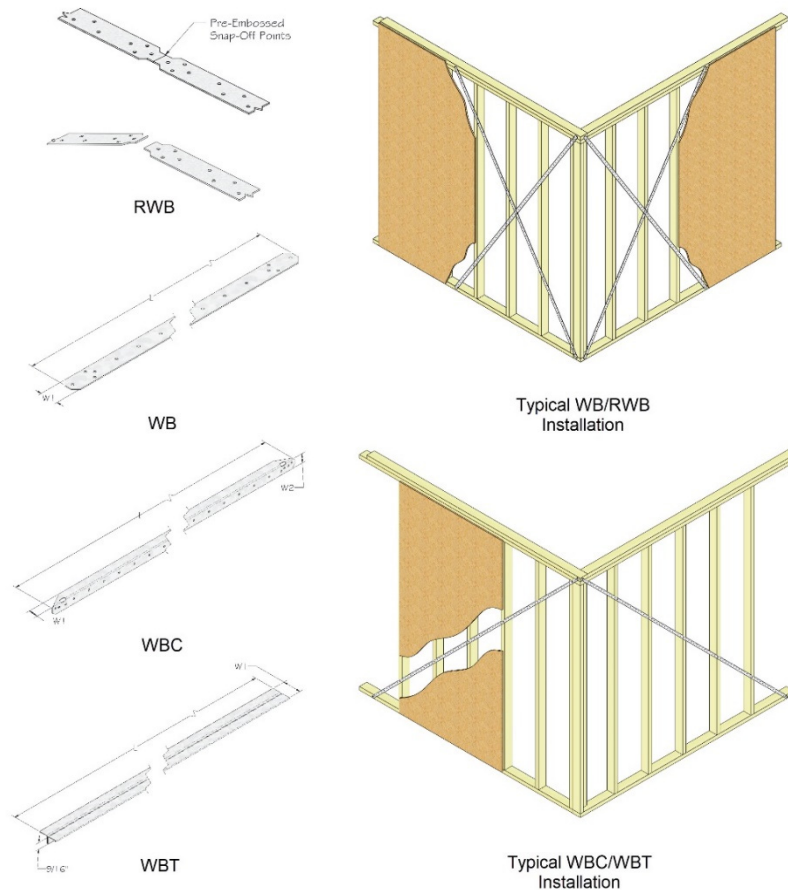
RWB, WB, WBC, AND WBT WALL BRACING
